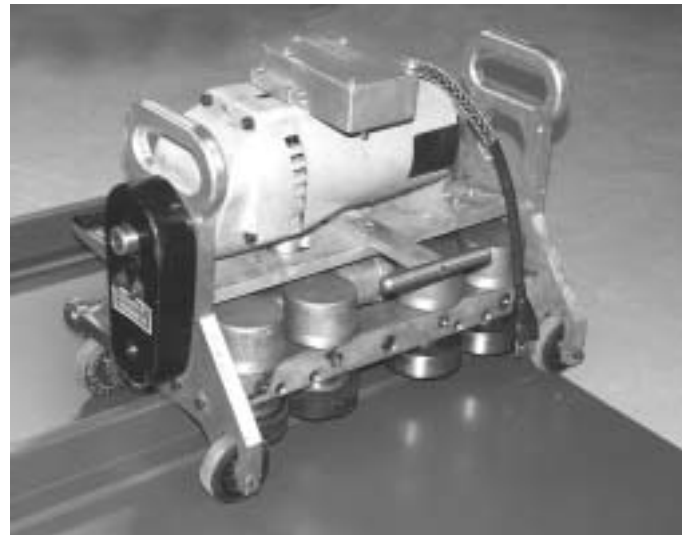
DOUBLE LOCK SEAMER ON PANEL AT STARTING POINT
